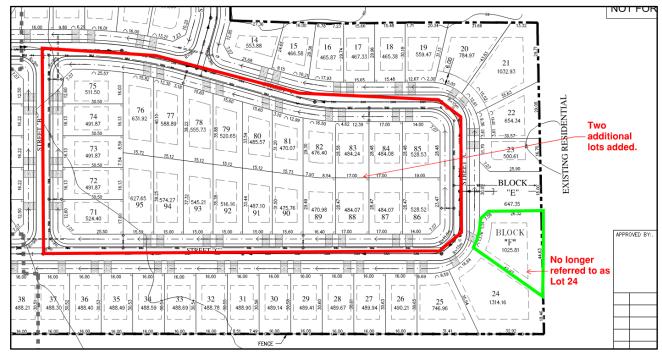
Proposed Draft Plan of Subdivision Revision 2021
